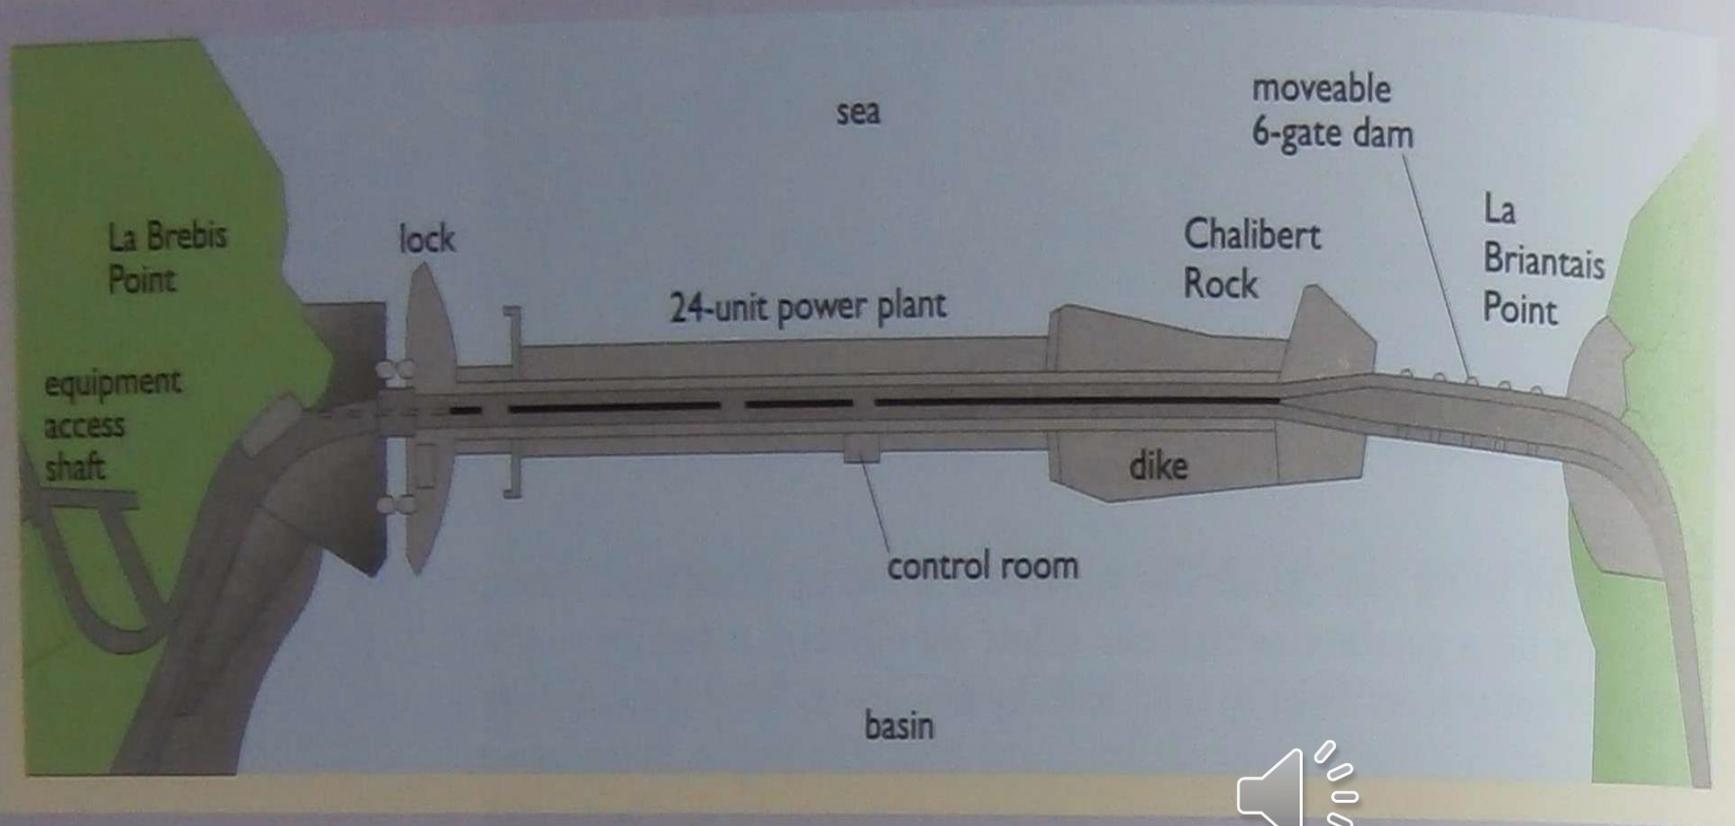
Layout of the Rance Barrage (source: Department of Energy, 1981)
